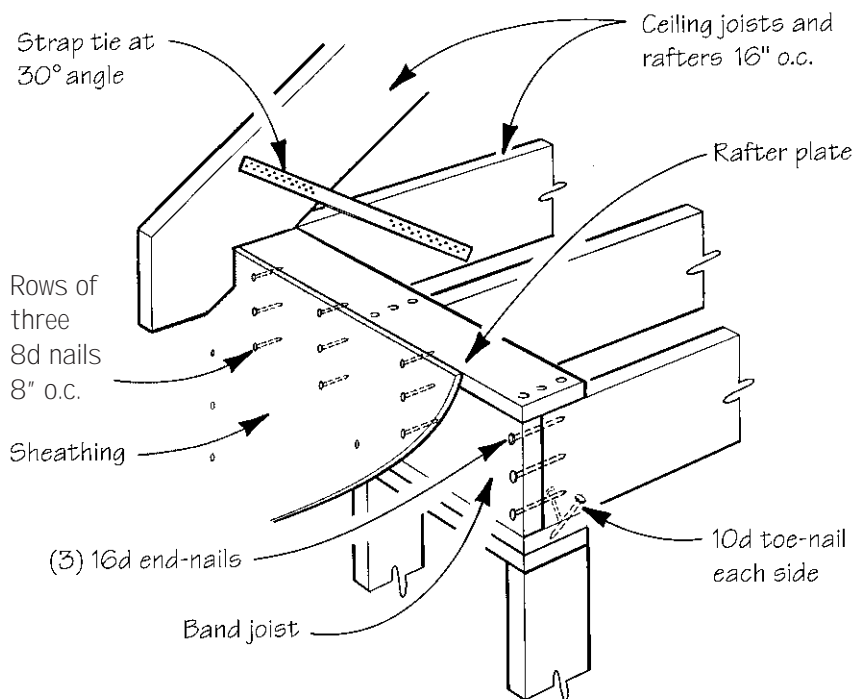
Framing a roof on top of a raised rafter plate allows room for extra insulation above the top plates, but it may weaken the important connection between the ceiling joists and the rafter ends. Using a rated strap tie at every rafter maintains this connection, which helps prevent the roof from spreading. The strap tie also transfers uplift forces from the roof to the ceiling joists.
